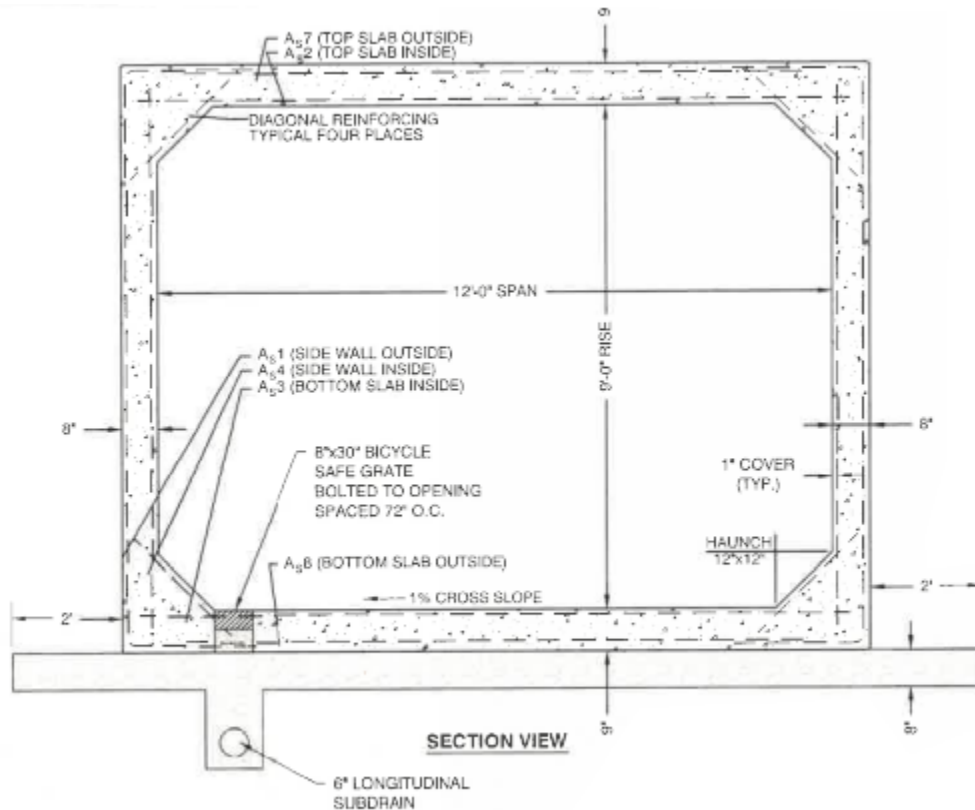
Typical section from existing plans showing 8" granular material and subdrain below culvert
